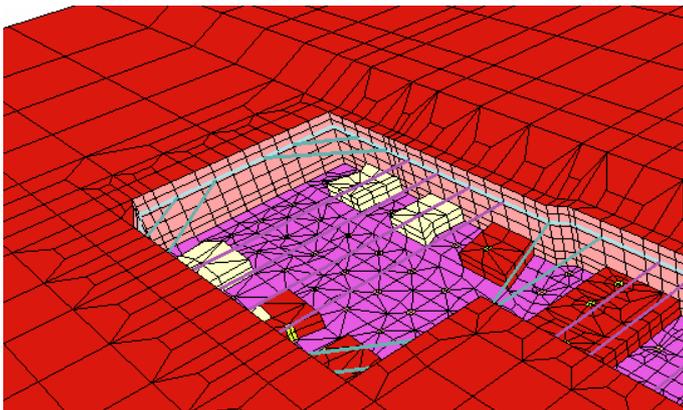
Illustration of a construction stage of the foundation mat (3D model)
